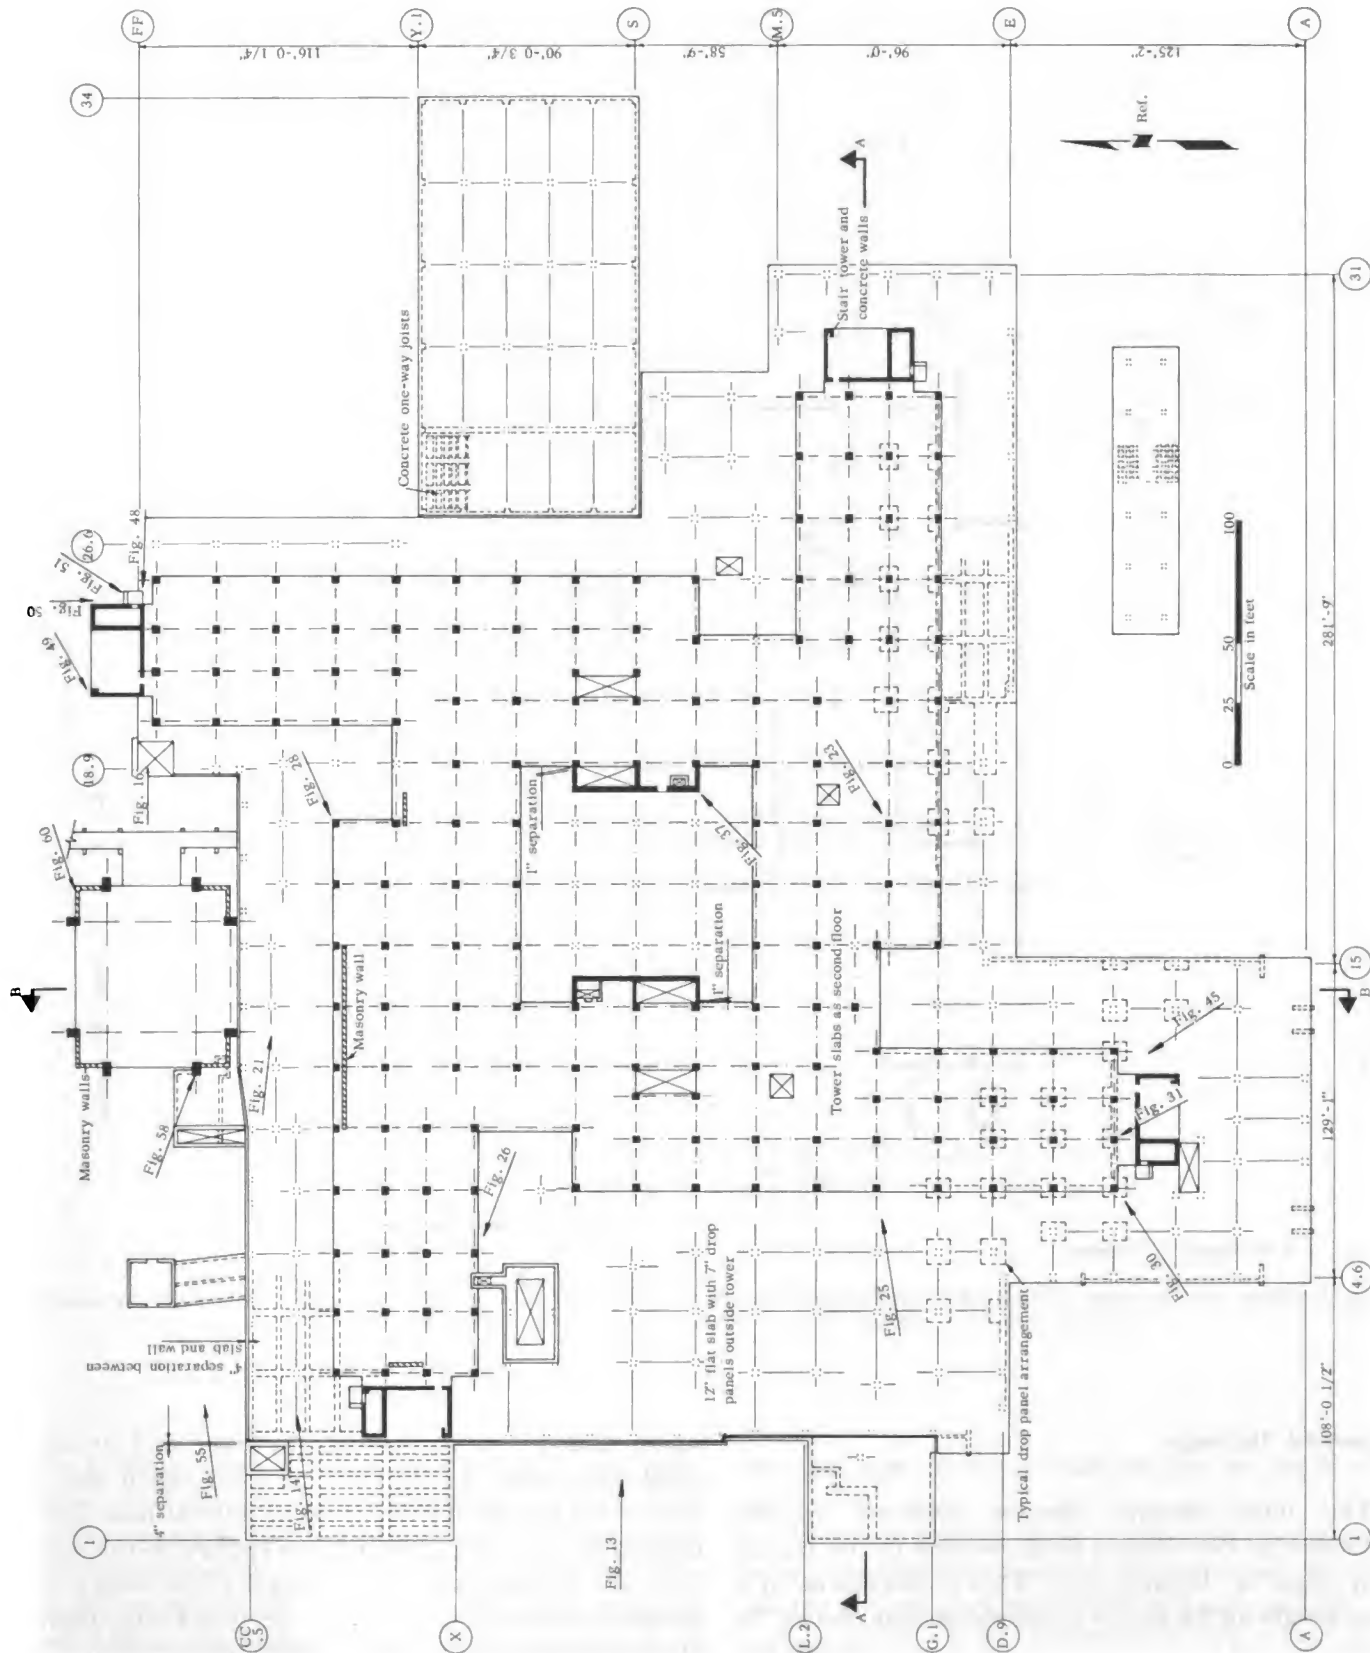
Olive View Hospital, medical treatment and care unit. First-floor framing plan.
